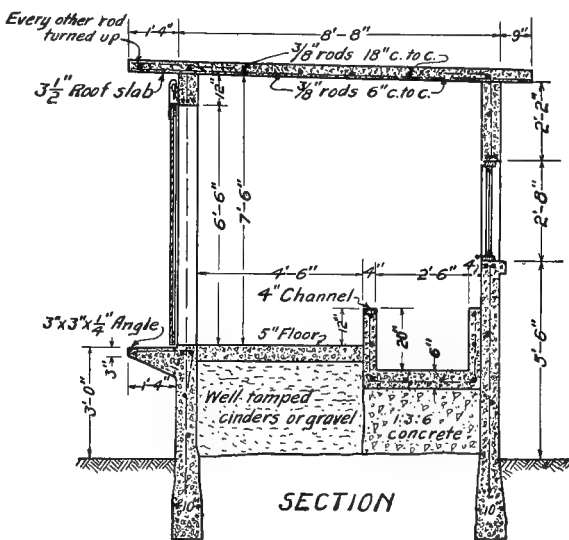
Reinforced Concrete Milk House with Loading Platform—Sectional View.
